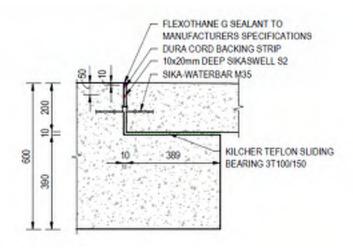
Kilcher Teflon Sliding Bearing 3T (100/150) Detail
